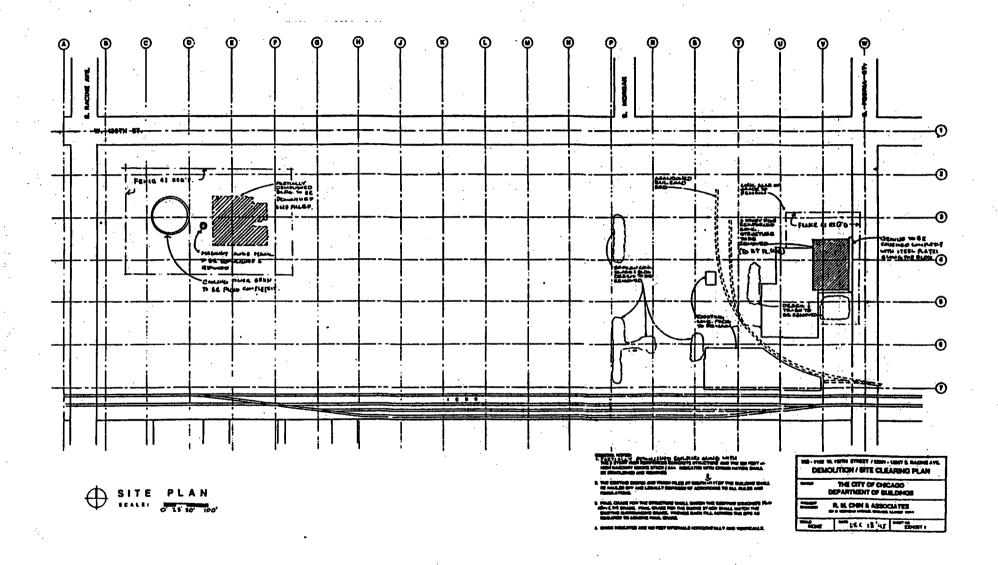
SITE PLAN Dutch Boy/IH Air Monitoring
